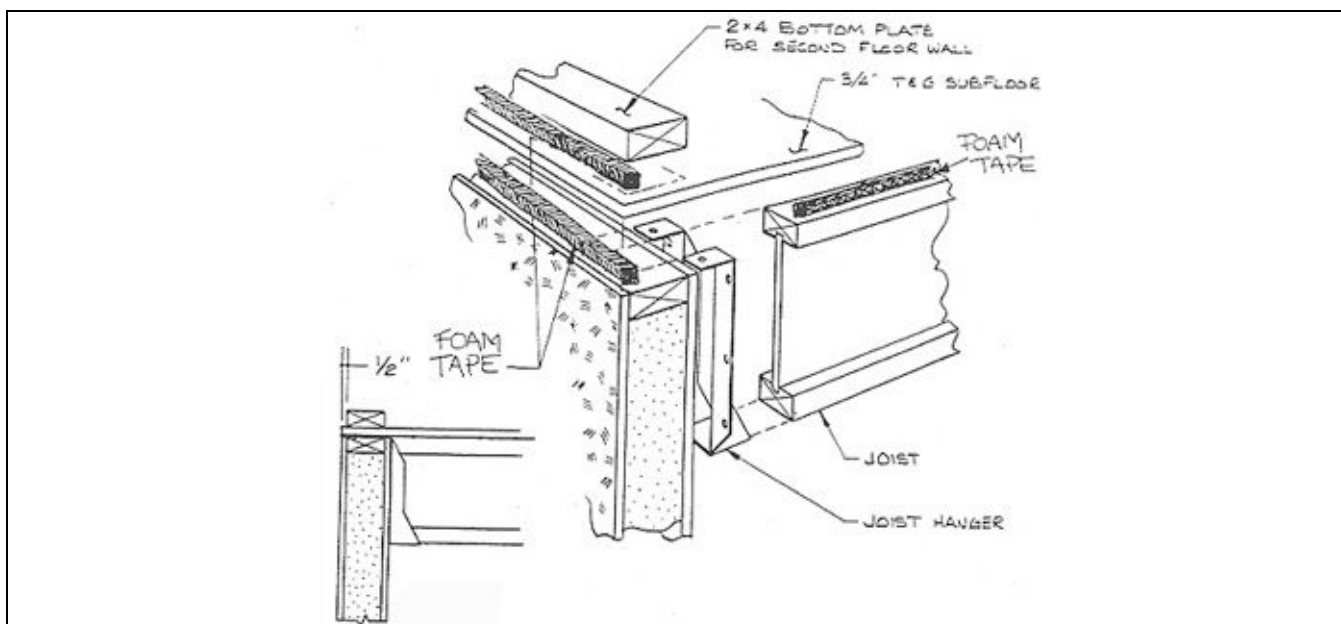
Laying Second-Floor Deck: The second-floor decking extends all the way to the outside of the wall panels to fully tie the walls together. Apply foam tape as shown, both on the top spline and joists. Once decking is installed, the bottom splines for upper walls are secured (use the same order of assembly as with the first floor). The bottom splines should be set $\frac{1}{2}$ " in from the outside edge of the decking.
